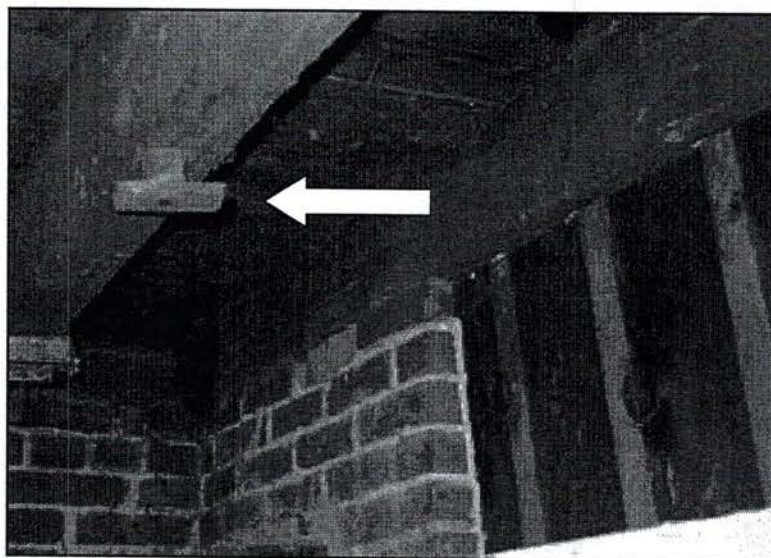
The awning windows in Room 002 were held up by wooden hooks (arrow).
